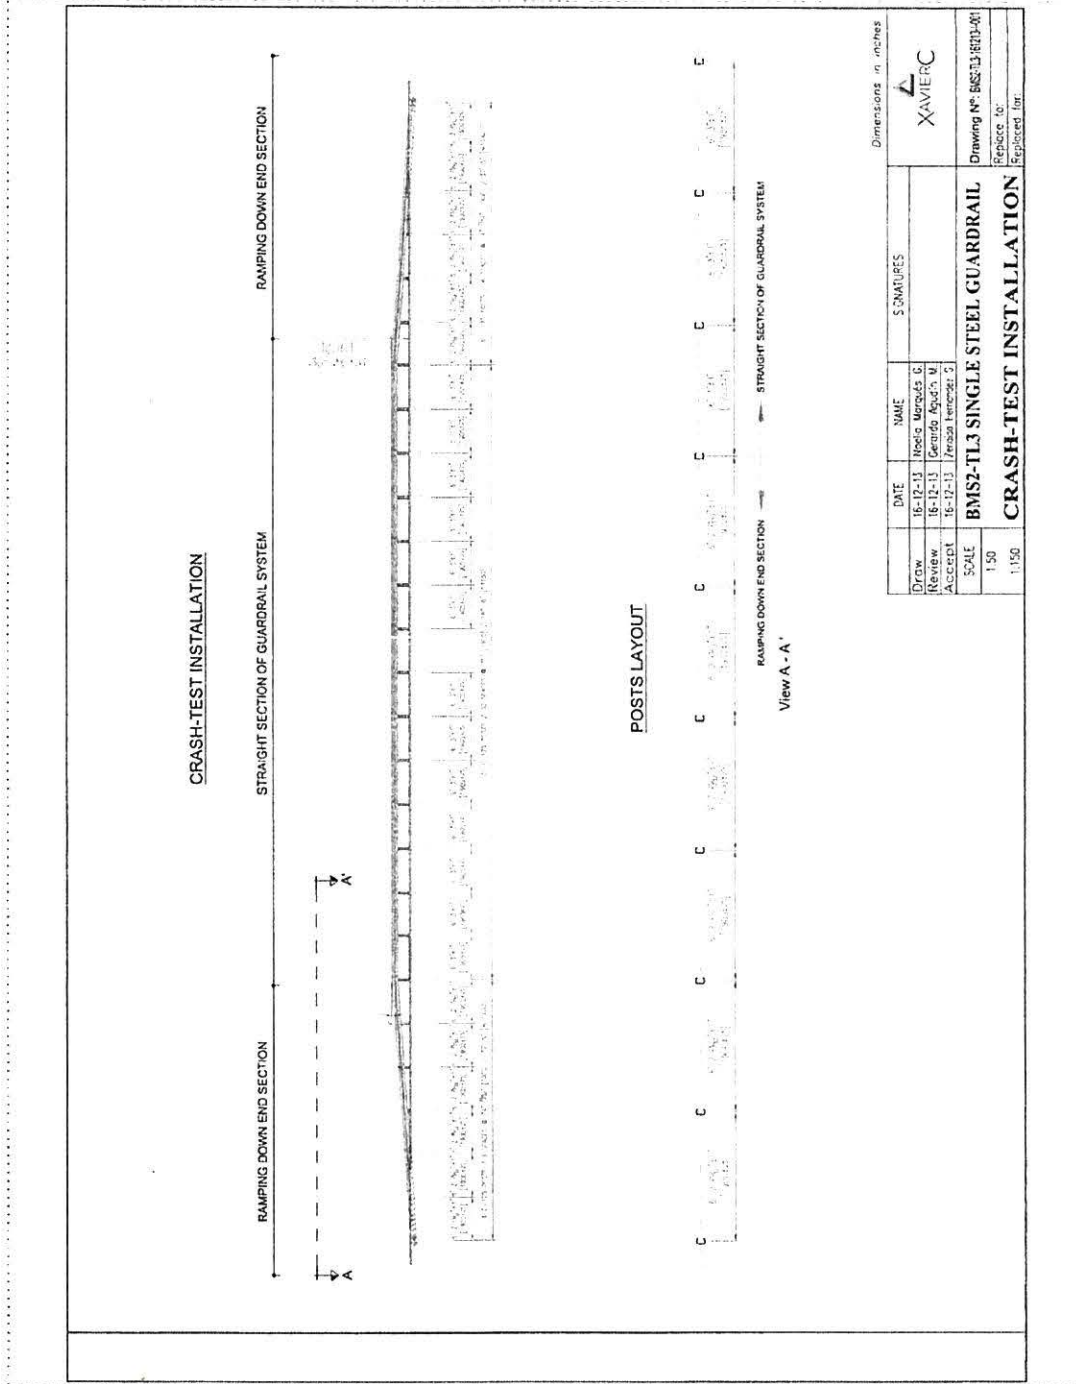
Details of the BMS2-TL3 SINGLE STEEL GUARDRAIL
